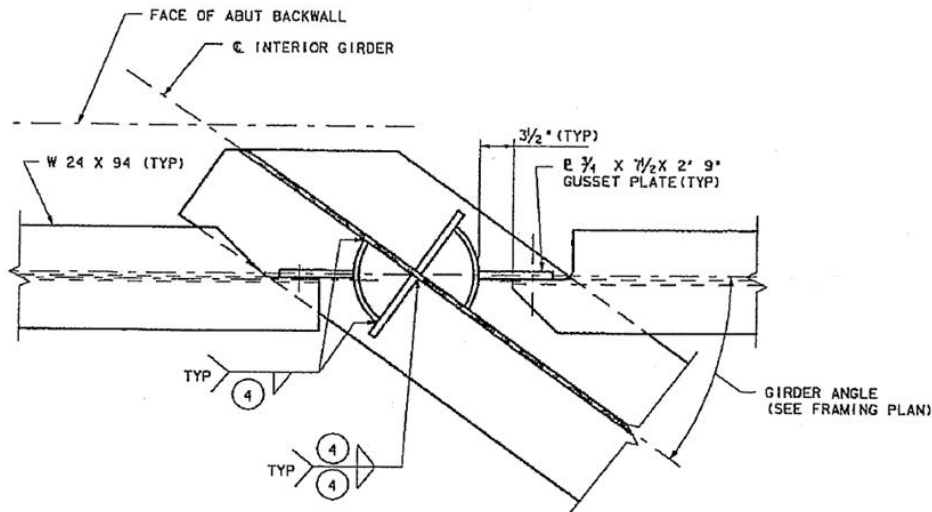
Plan View of Quarter Pipe Stiffener Detail
